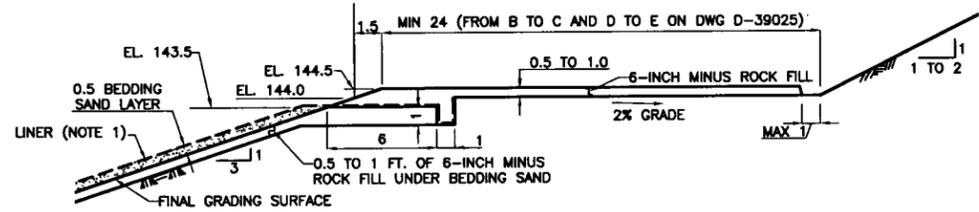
EMBANKMENT CREST AND GEOMEMBRANE DETAIL (TYP)
